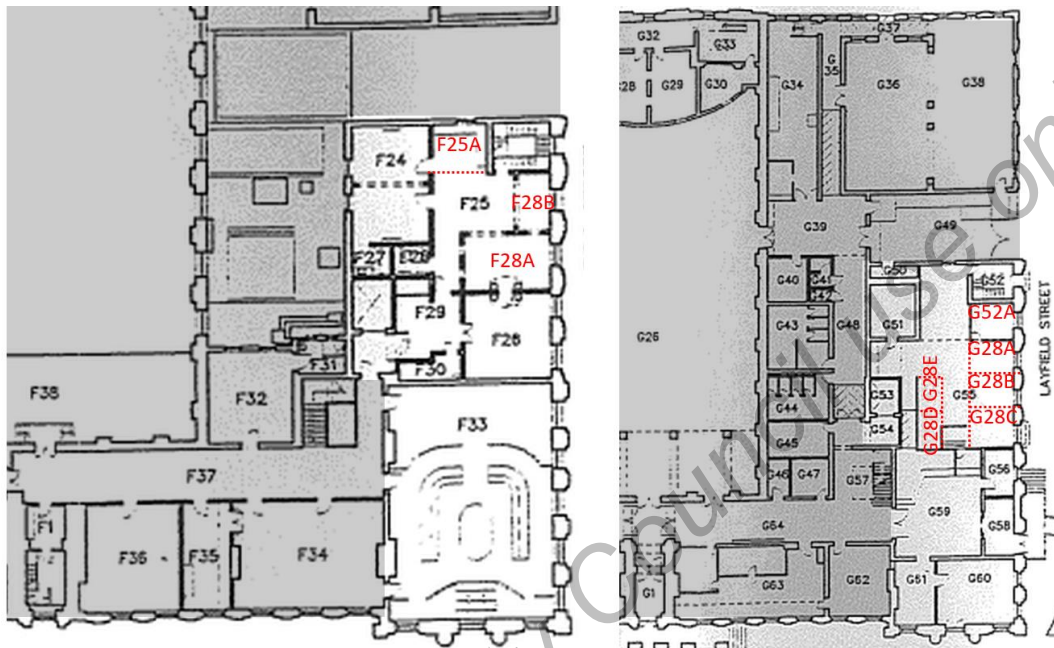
East wing plan arrangement (Ground floor – right; First floor – left).
